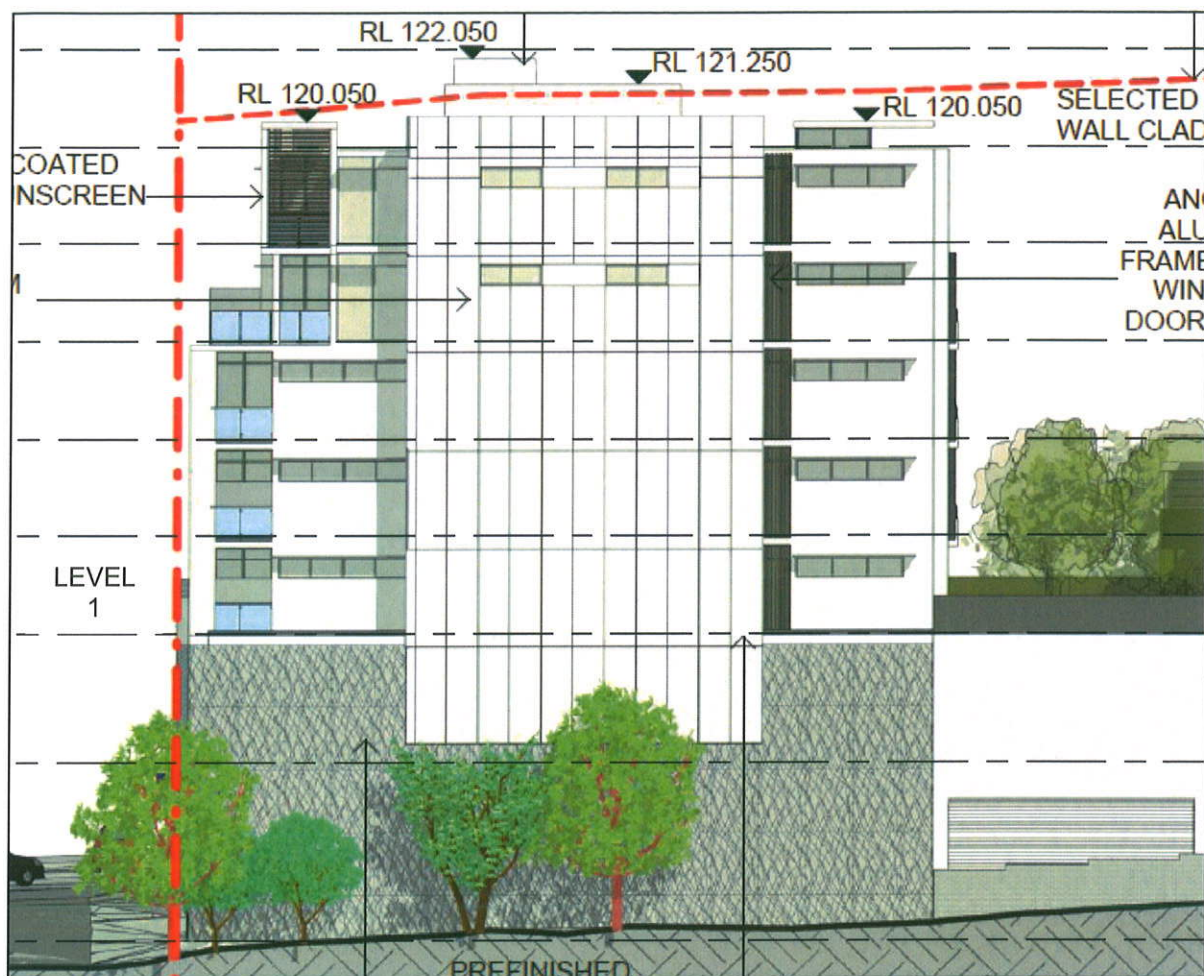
Eastern Tower, northern elevation (Source: Proponent)
